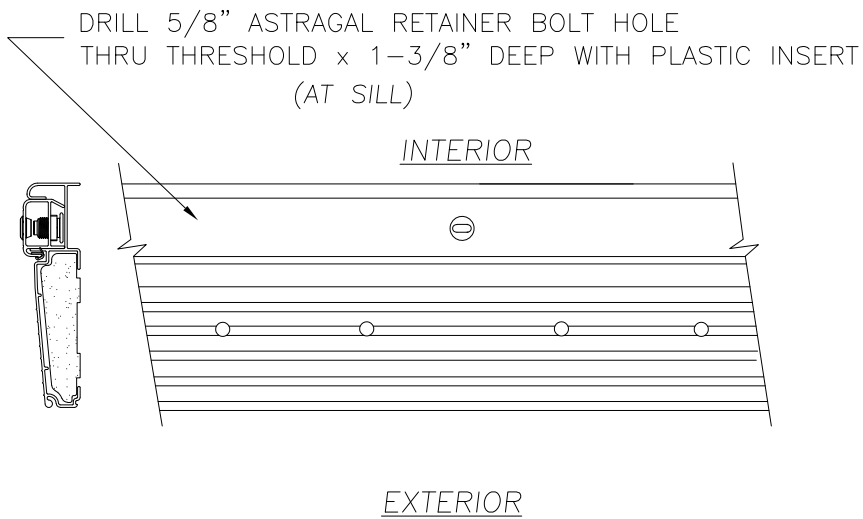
DETAIL B - THROWBOLT STRIKE PLATE MOUNTING
